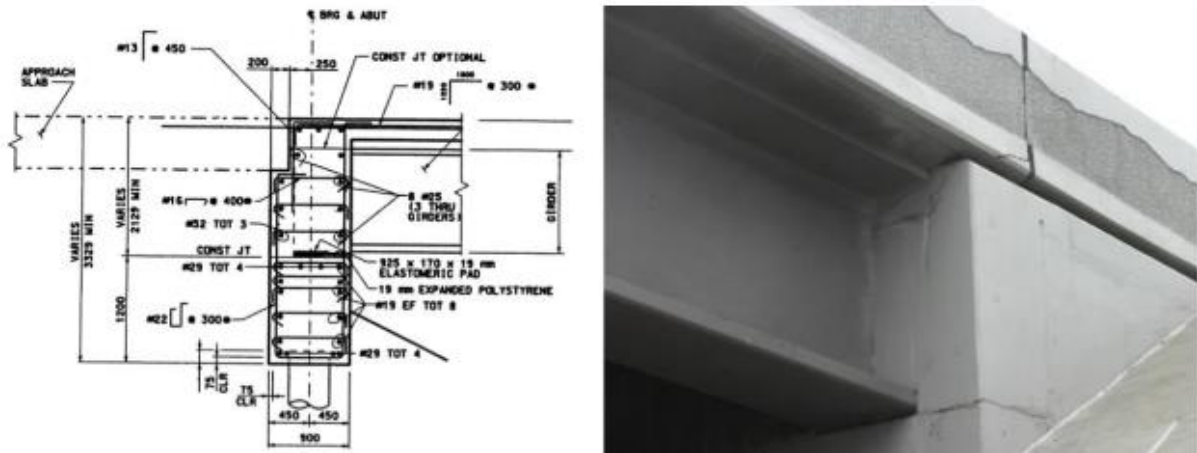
Detail view of abutment with reinforcing shown along with photo of actual abutment. (Huffaker, 2013)
